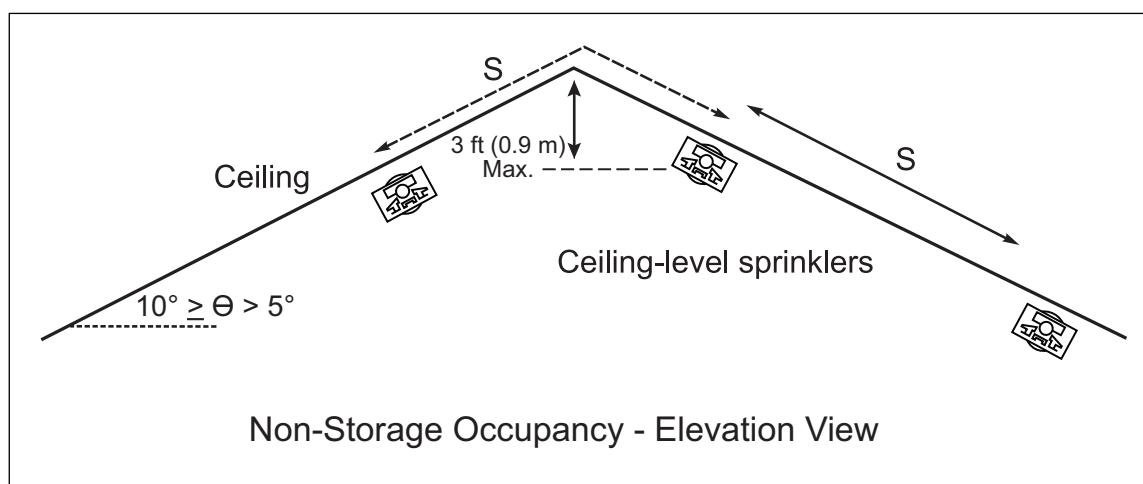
Location of Nonstorage sidewall sprinklers near ceiling peak when slope exceeds 1 in 12 (5°)
